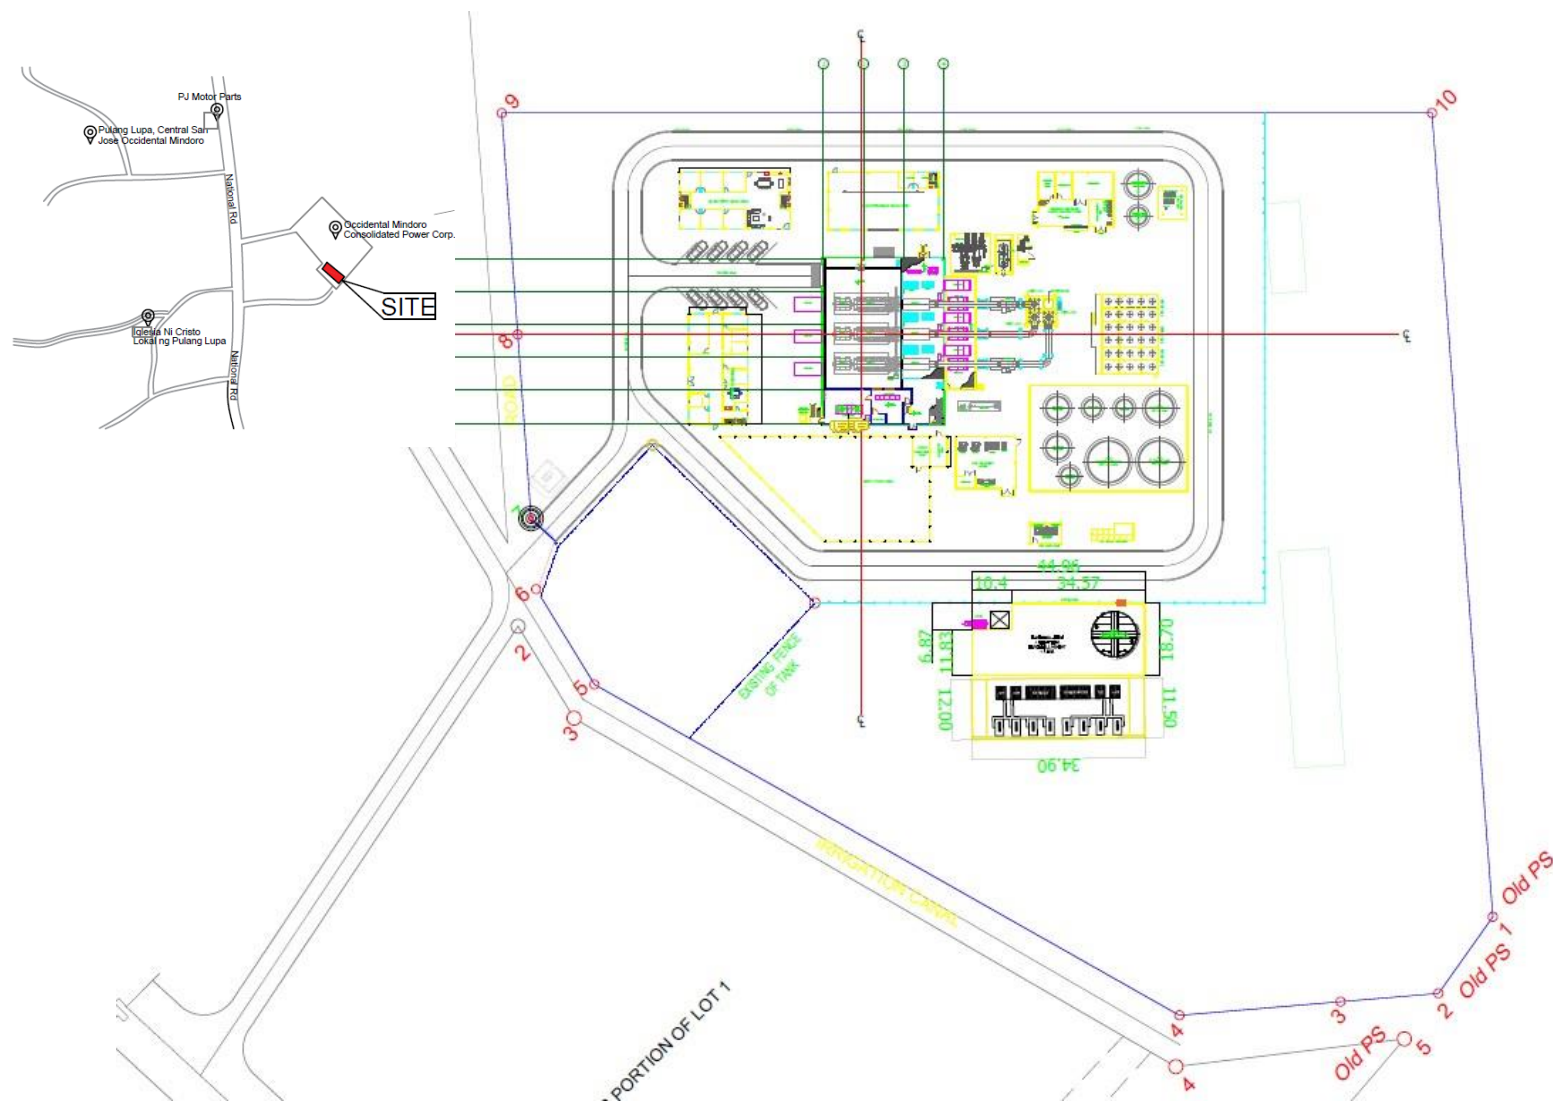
Site Development Plan of the existing power plant and the proposed expansion powerhouse
